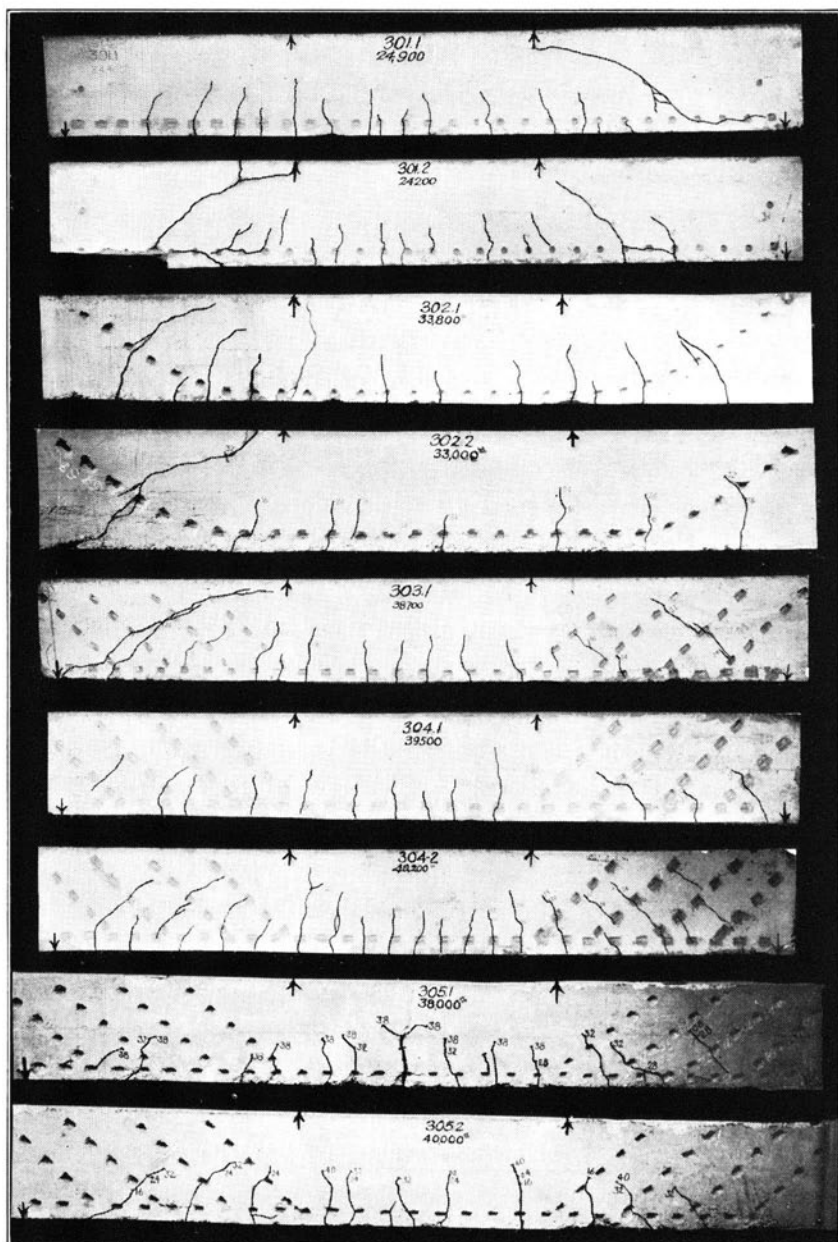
VIEWS OF BEAMS AFTER FAILURE, SERIES OF 1913
